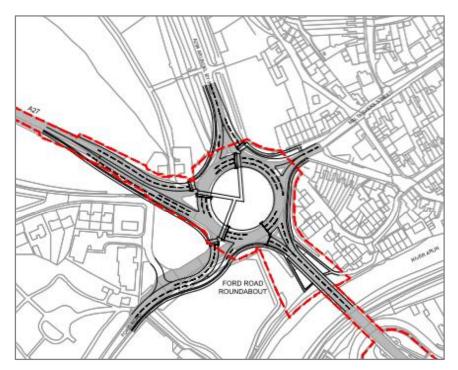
Proposed layout of Ford Road roundabout, Option 0A
